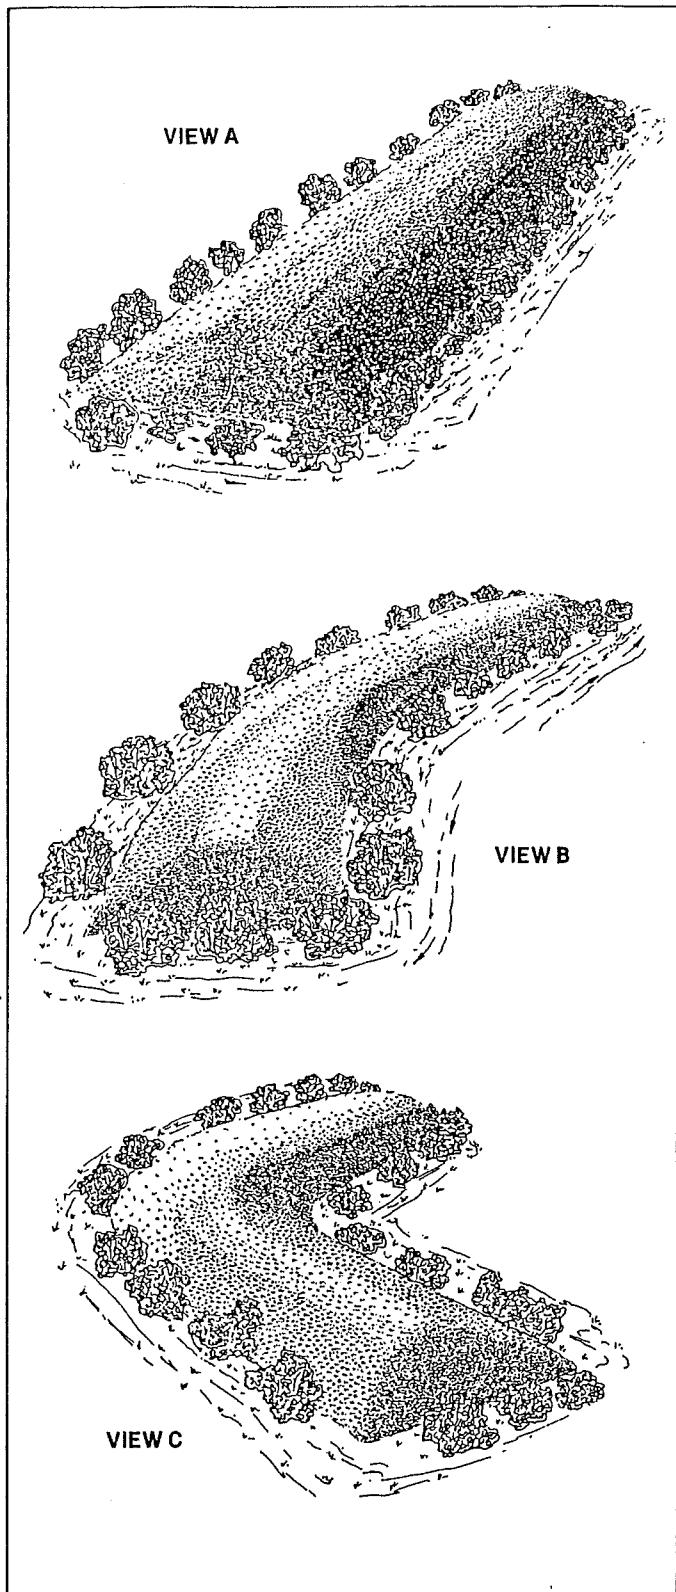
Three Mound Shapes That Can Be Utilized to Fit Landscape Requirements: View A, Rectangular Mound on Uniform Slope; View B, Contour Mound for Hillside; View C, Right Angle Mound or Lot Corner Location. Diversions Must be Constructed Upslope of the Mound to Divert Surface Runoff Water. (Univ. of MN Ext. Bulletin 304)
